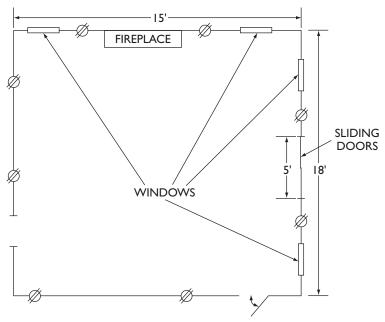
Receptacle requirements in a living room that has sliding doors on the outside wall.
